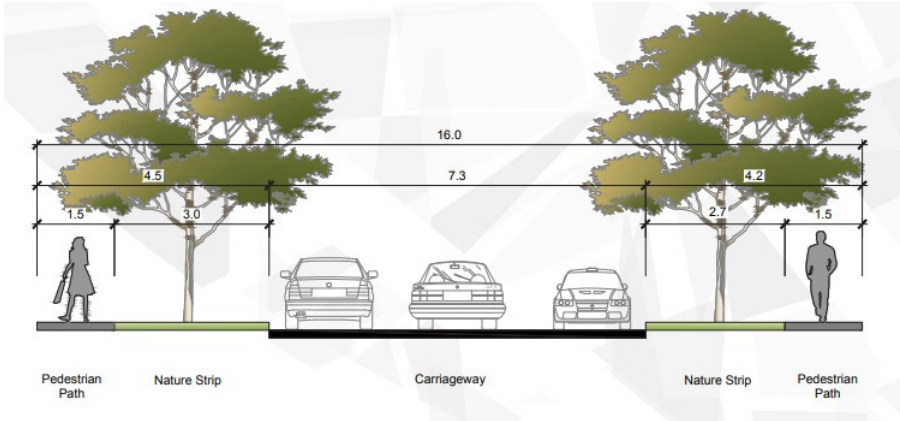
Cross section of the VPA Local Access Street 1 (16m)
